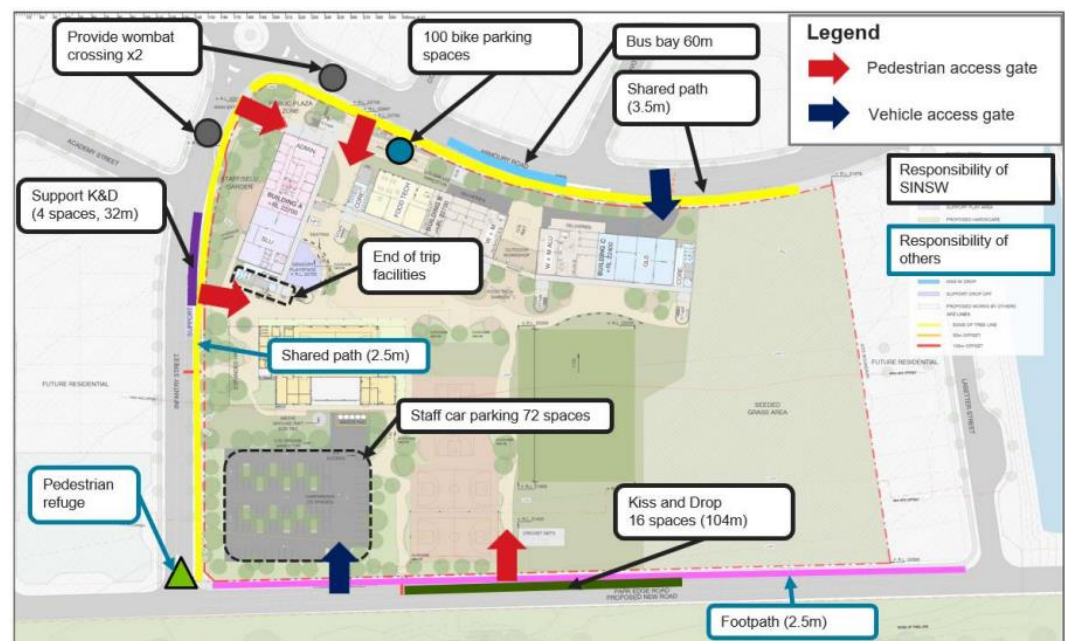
Site Access and Parking Arrangements – Stage 2 with permanent works
